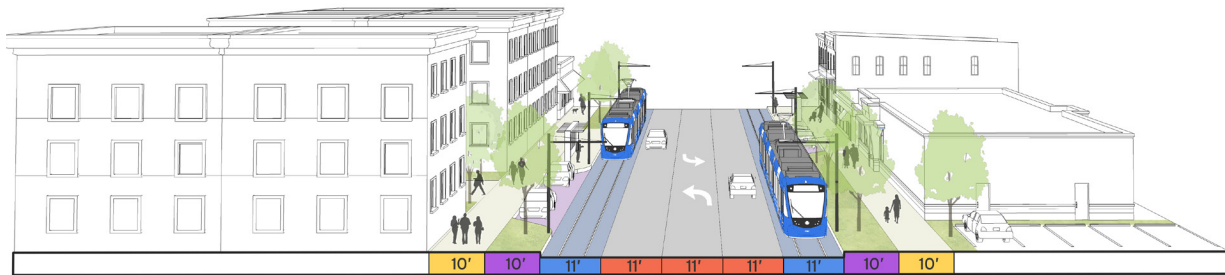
STREETCAR OPERATING IN MIXED TRAFFIC ON INDEPENDENCE AVENUE MAINTAINING ON-STREET PARKING AND TWO-WAY LEFT TURN LANE
